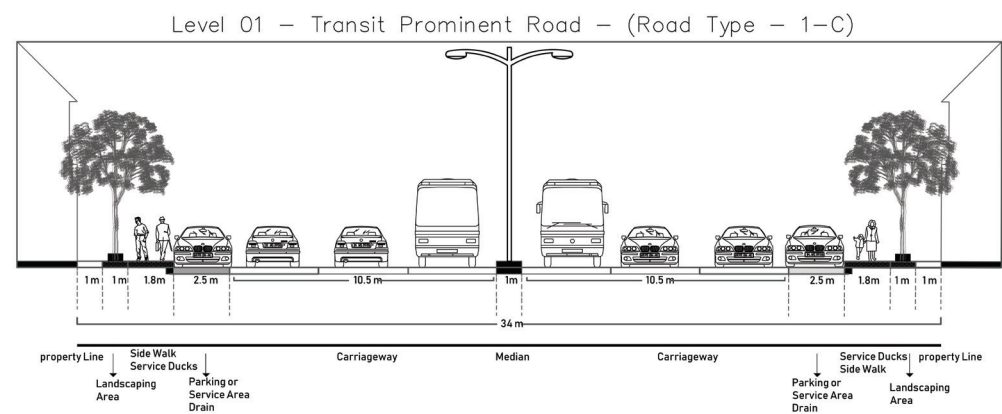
Cross section of a Level 01 – Transit Prominent Road - (Road Type - 1-C)
